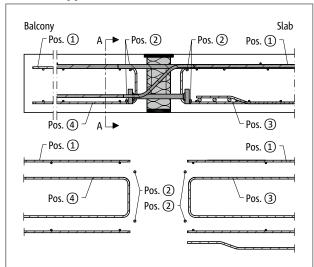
Schöck Isokorb® T type K-M12: On-site reinforcement with indirect support
